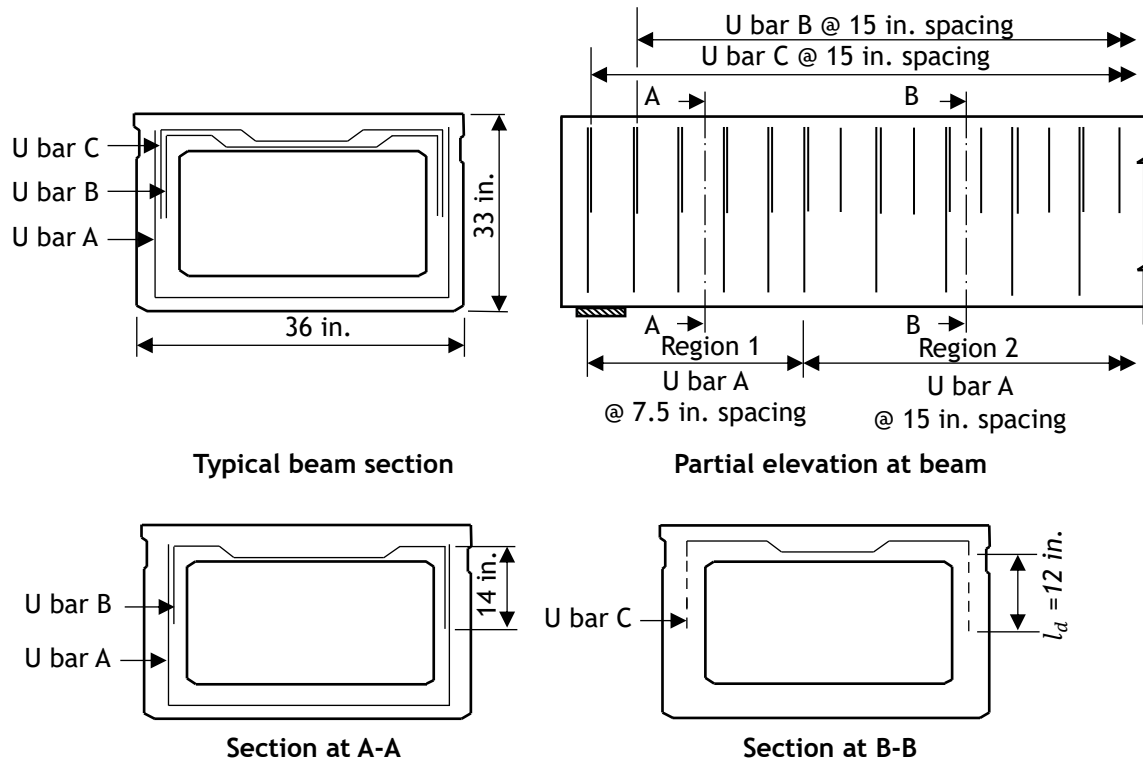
Typical beam section and elevation of B21-48 beam.
